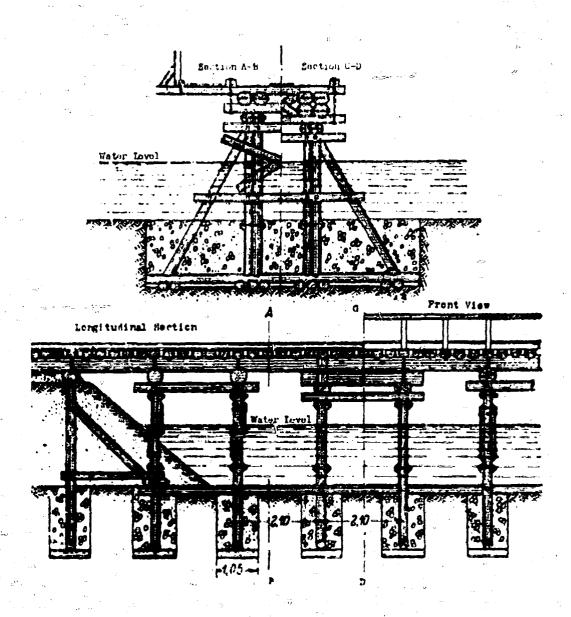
Unsatisfactory Design of Bridge Supports on Timber Grills in Swelling Ground
